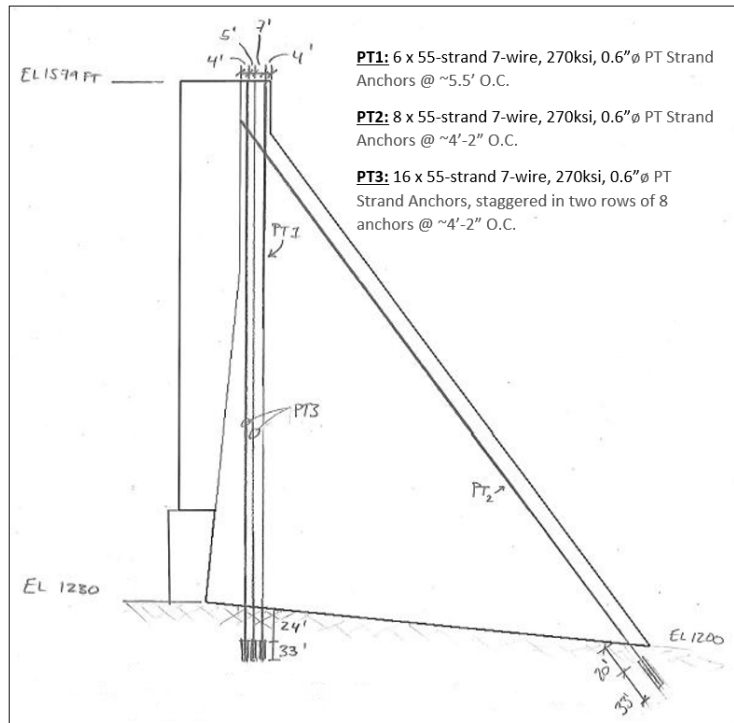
Typical section through intake monolith showing preliminary PT anchor layout to stabilize the dam for the 10,000-yr earthquake
